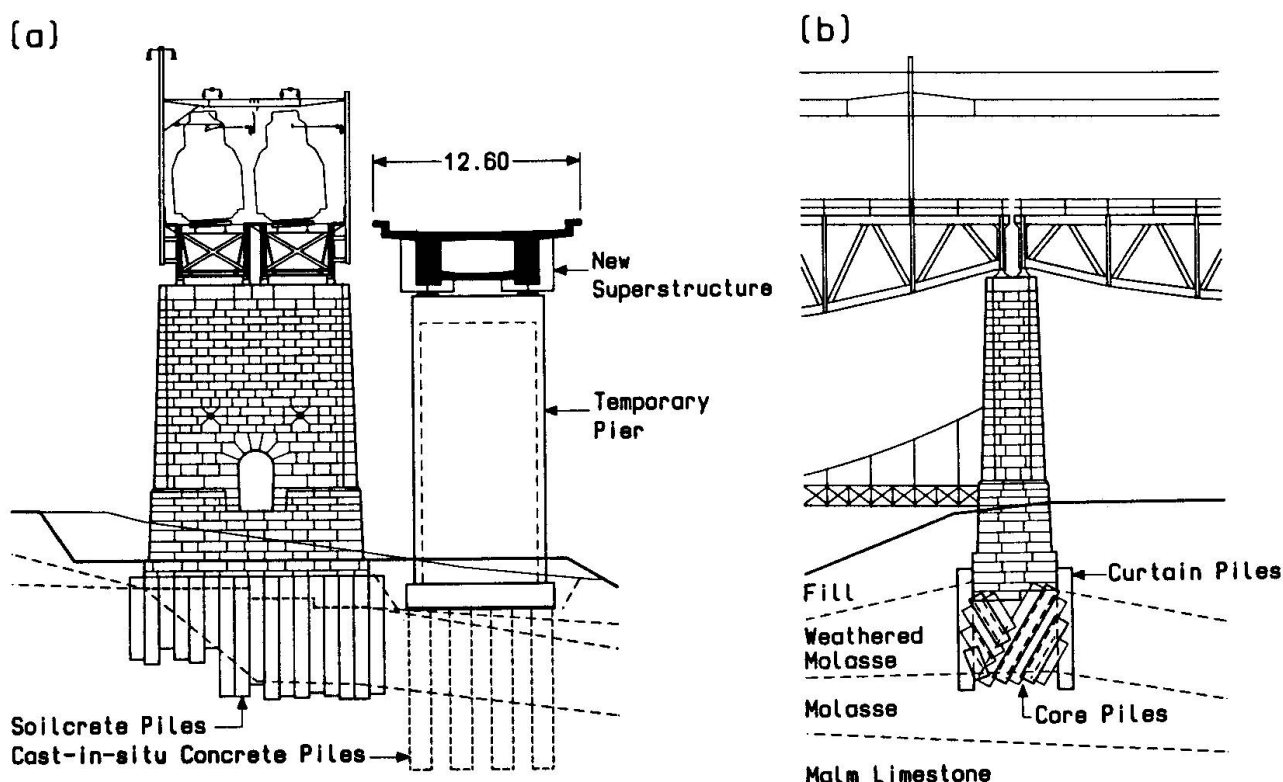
Soilcrete pile foundation of side piers: (a) Cross-section; (b) Elevation.
